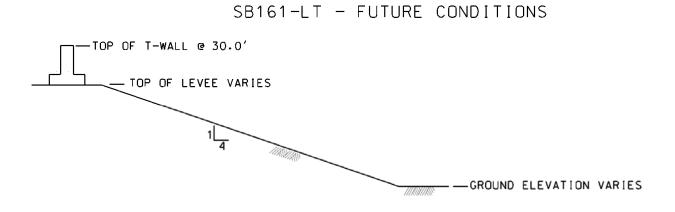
Typical Levee Design Cross-section Transition Reach Levee/Floodwall Combination (SB161-LT)
